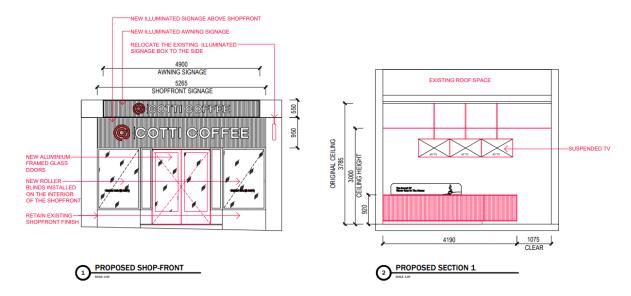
Proposed shop front elevation and internal section showing proposed new signage and internal fit out , Source: Aether Architects.
